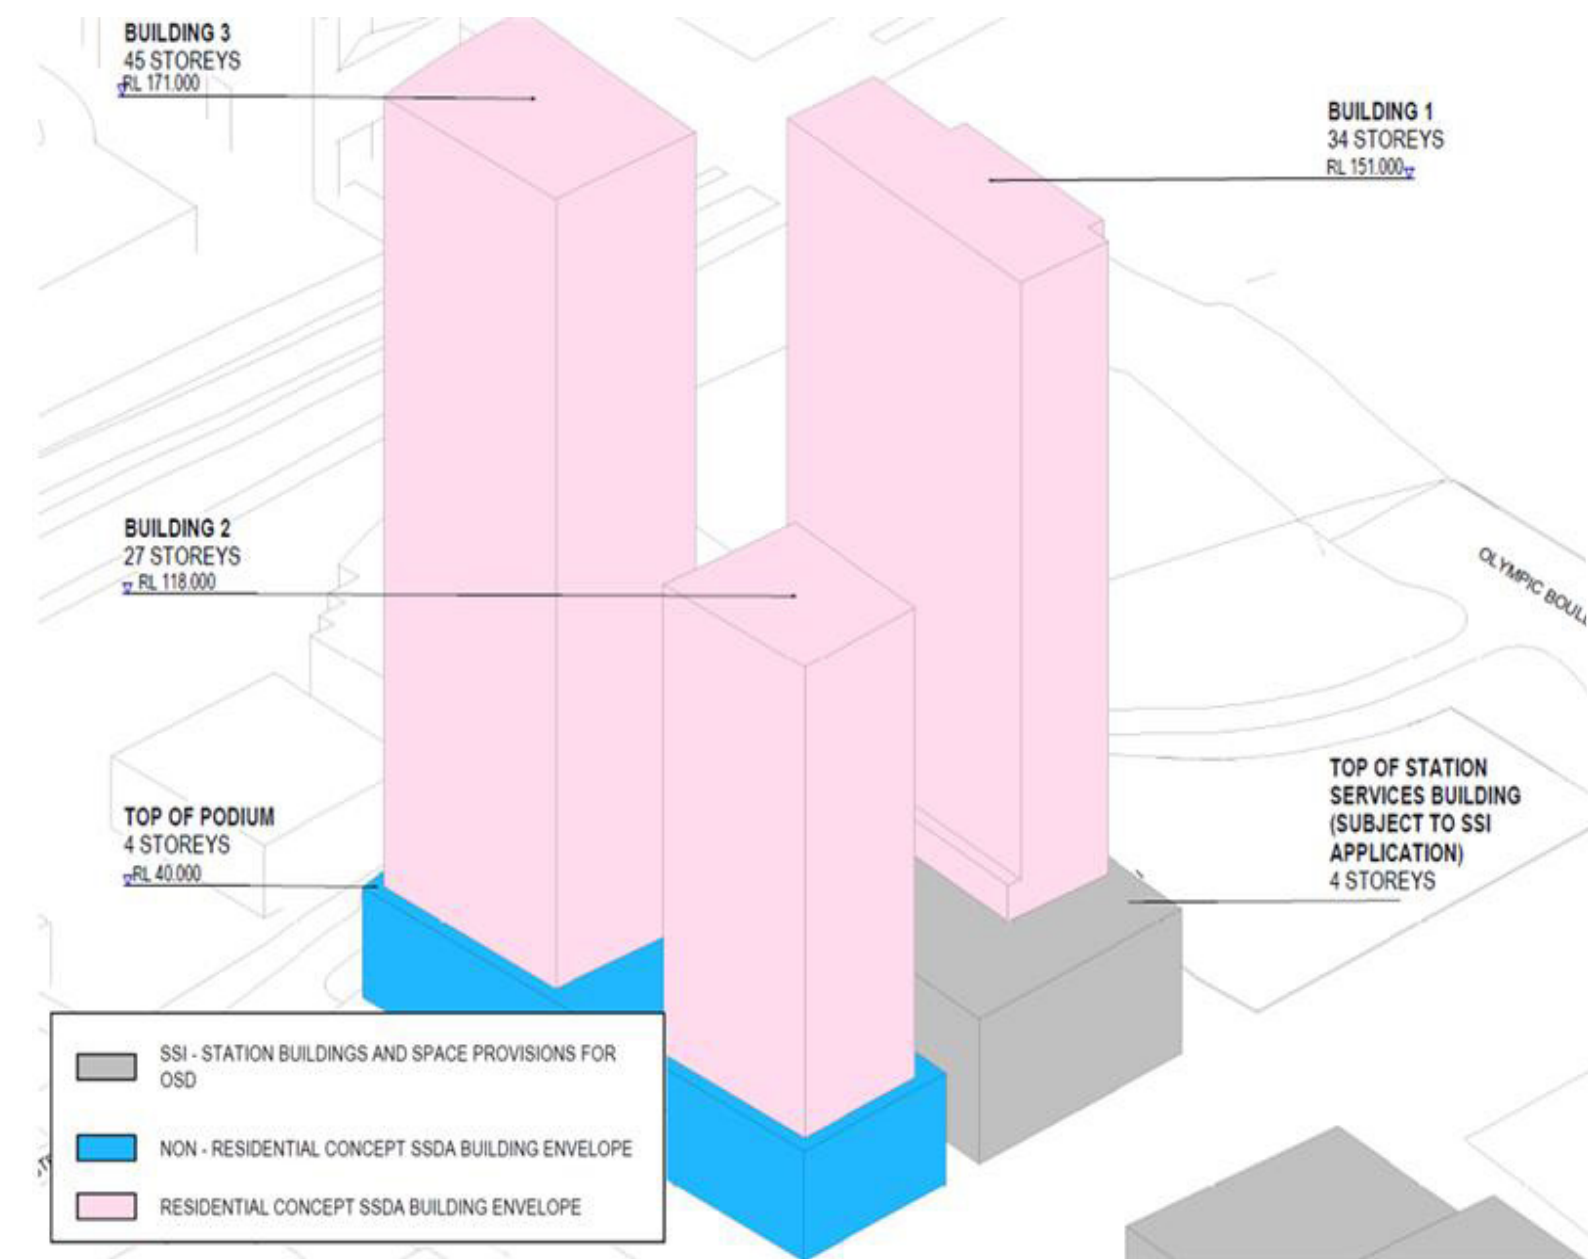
Sydney Olympic Park OSD Building 1 amended building envelope
